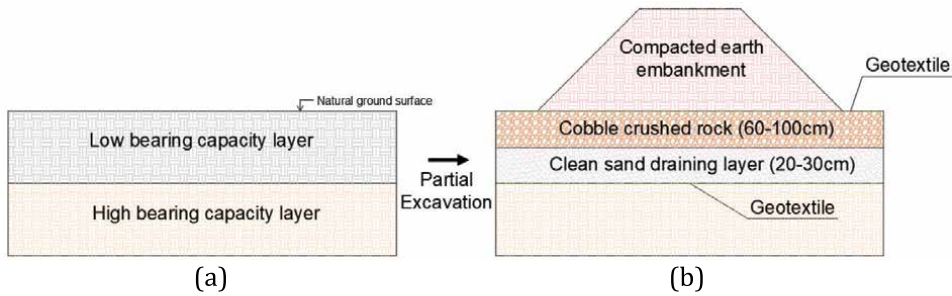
Partial replacement of natural foundations with low support capacity by drainage layers and greater shear strength in road construction.
